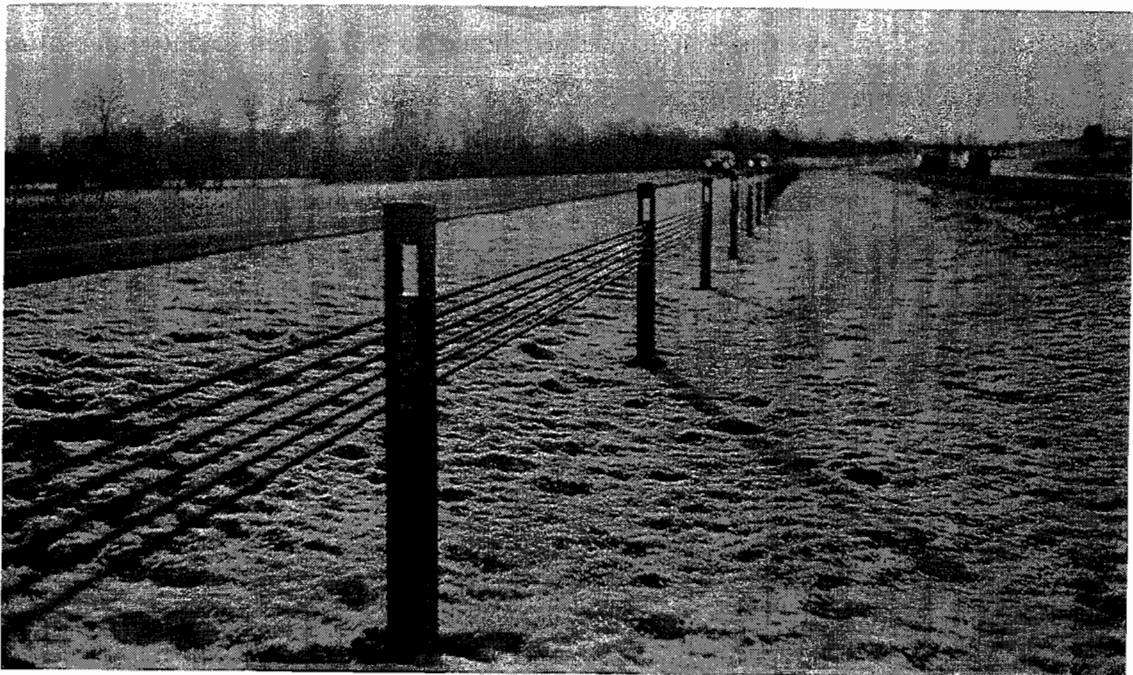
6 Cable Guide Rail on Steel Posts
